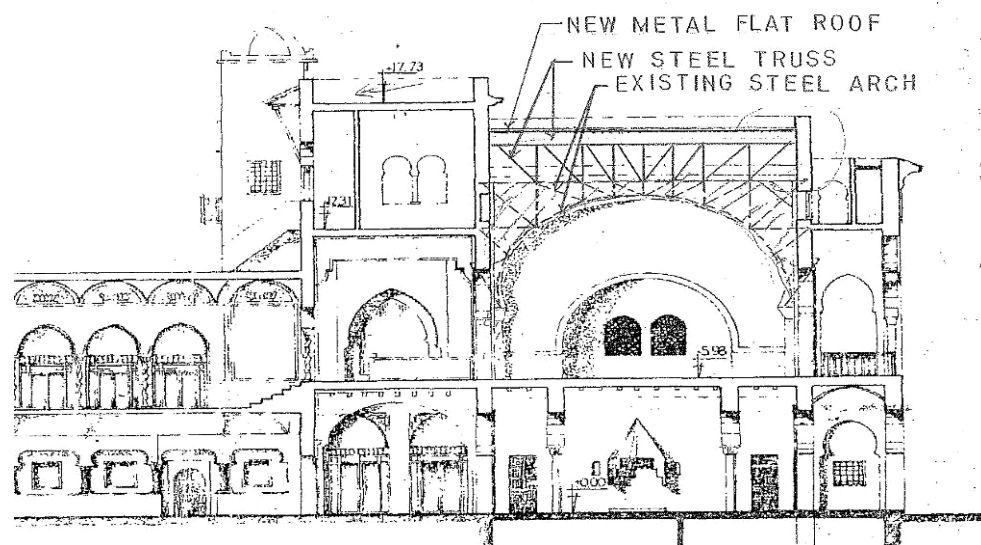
Additional Roof Truss Reinforcing for Existing Steel Arch
